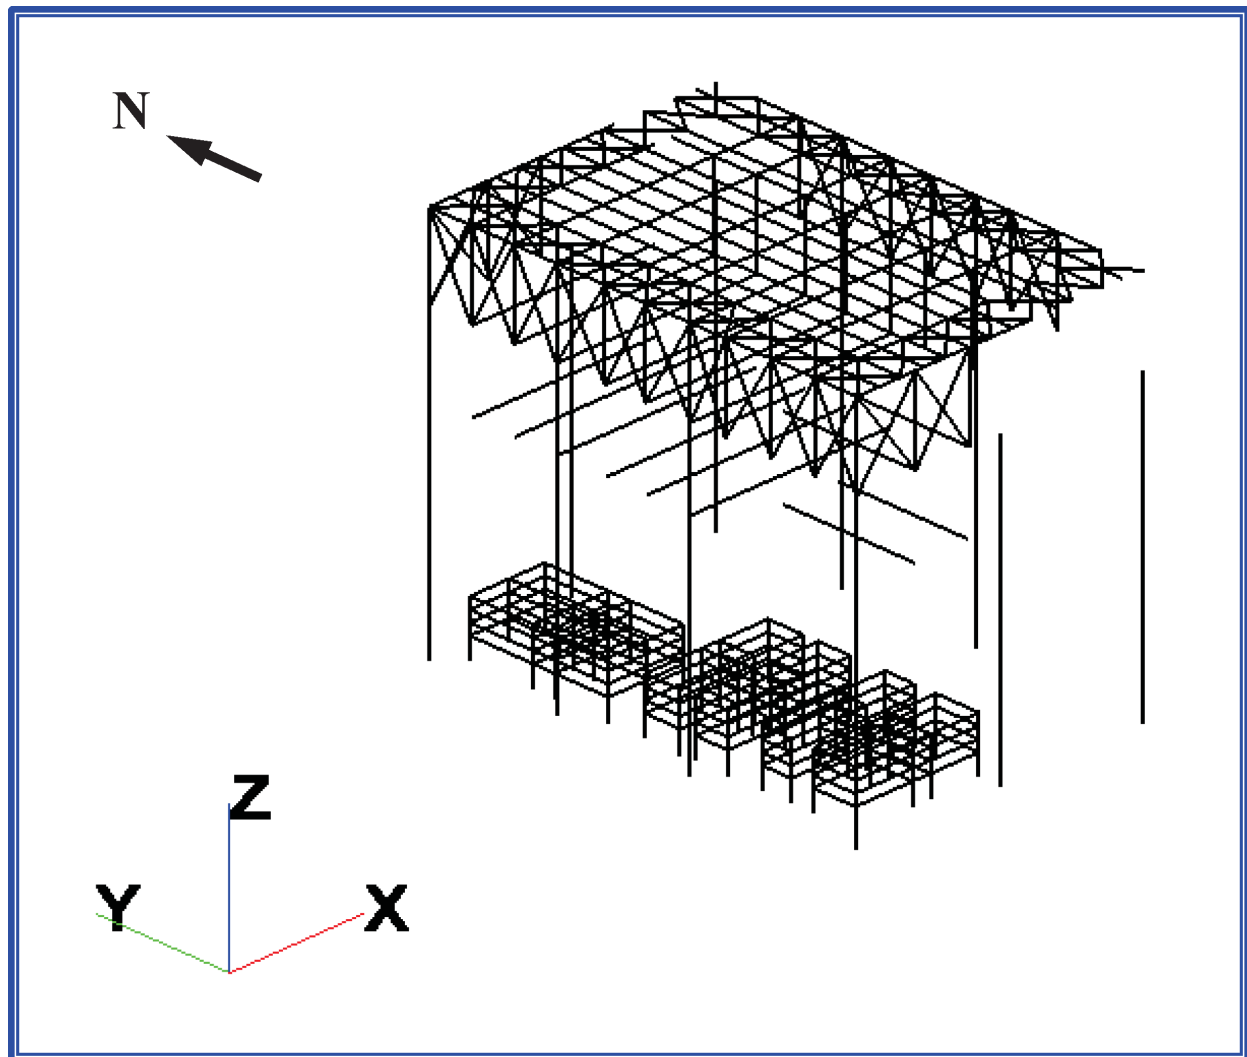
Structures and Backfill Soil of Triple Building SAP2000 Model
